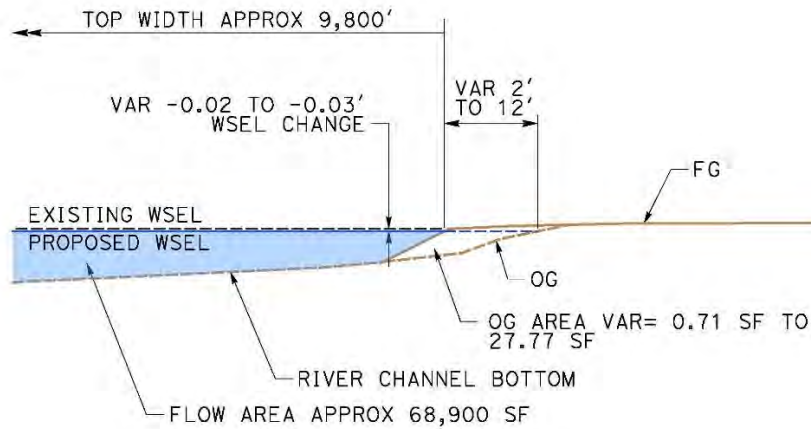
Typical Embankment Encroachment into the San Jacinto River Floodplain
